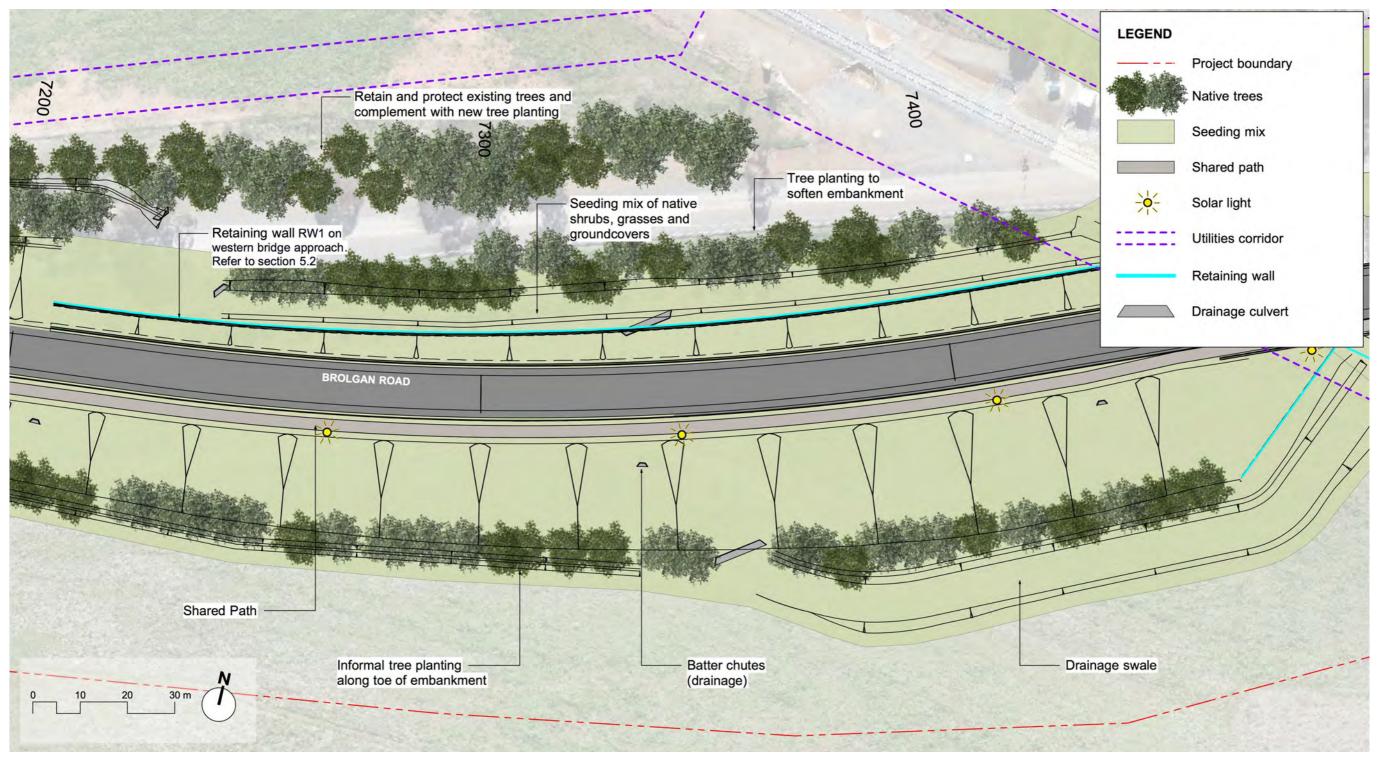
Typical embankment treatment plan, shown on the western approach to Bridge ST02 over the Parkes to Narromine rail corridor
